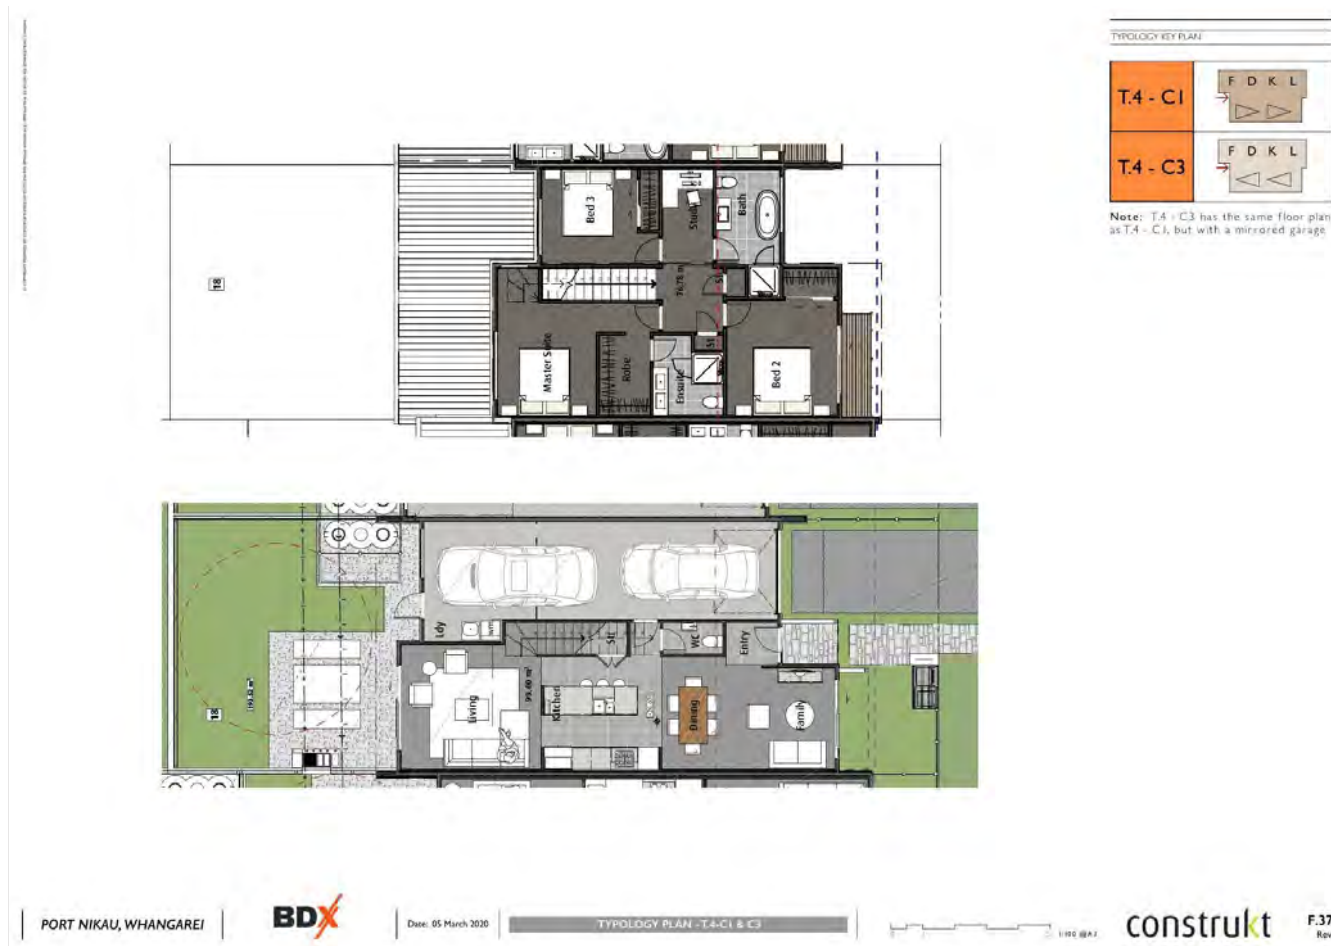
PDNA 1. Part F – Typology Plans and Elevations
